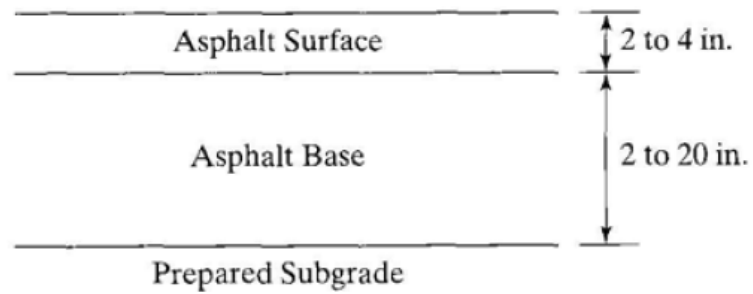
Full-depth asphalt pavement cross-section (Huang, 2004).
